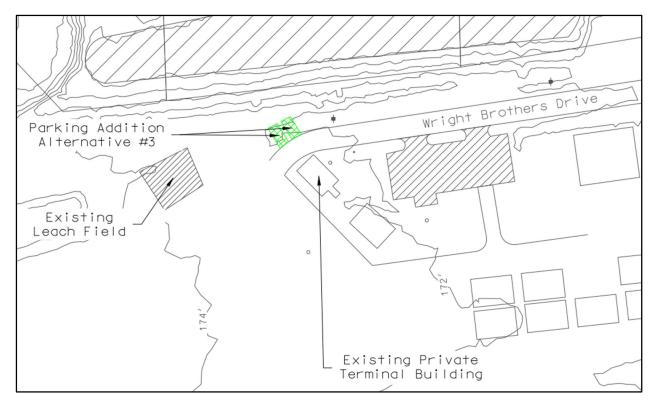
ADA Parking North of Existing Terminal (Alt. 3)
